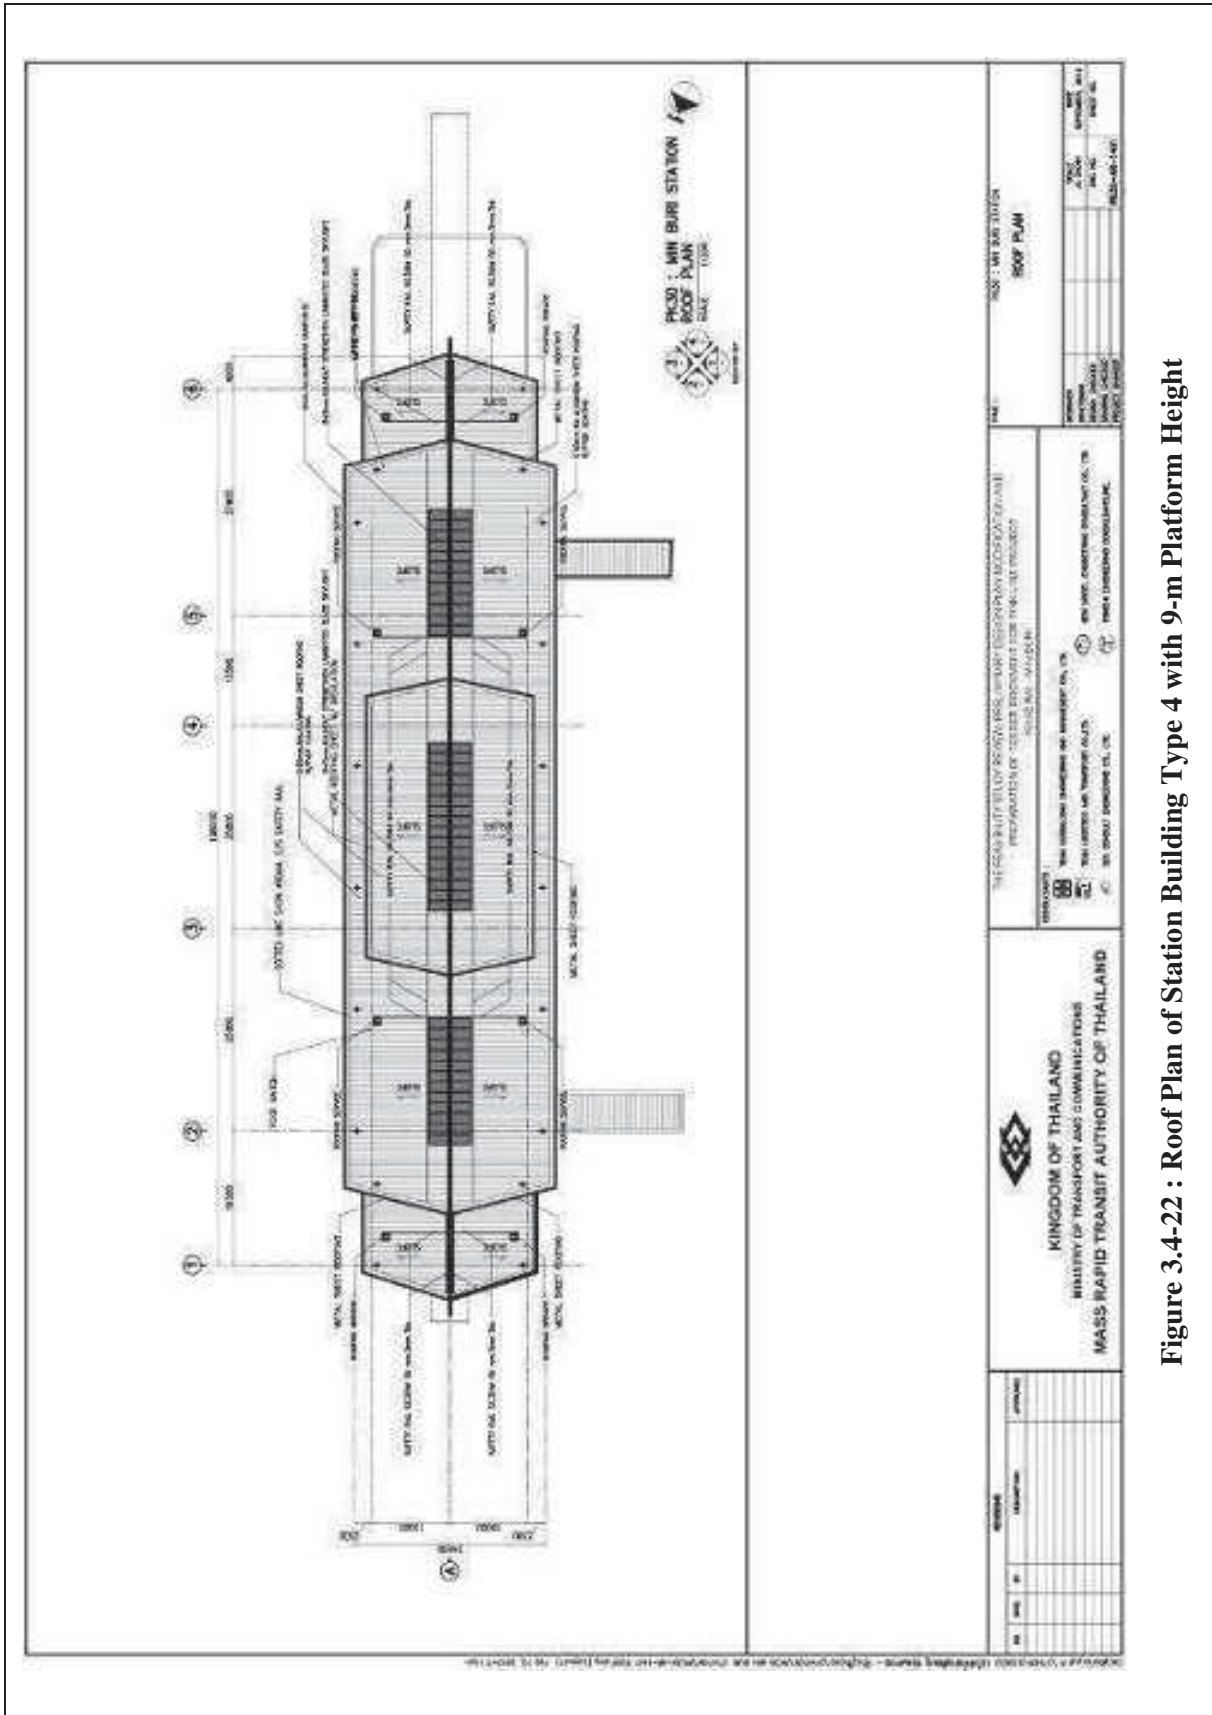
Roof Plan of Station Building Type 4 with 9-m Platform Height
